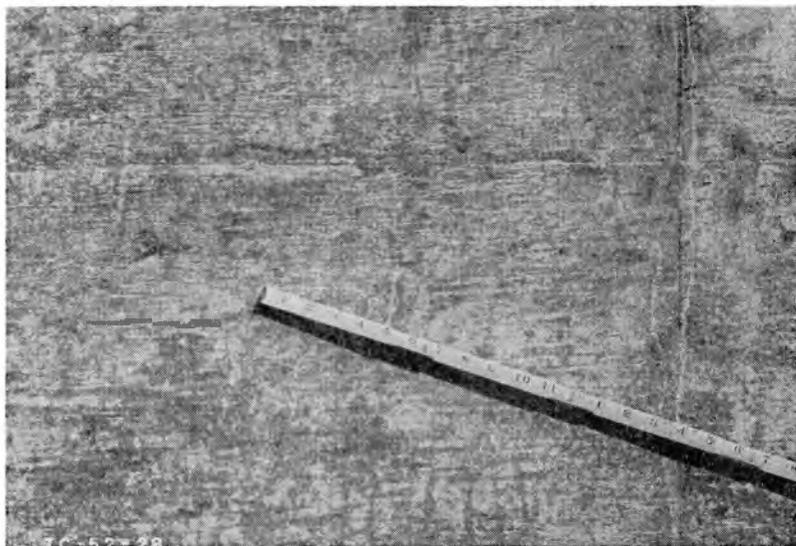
Some of bug holes shown in Fig. 8a were removed by extra vibration as shown in this picture.
